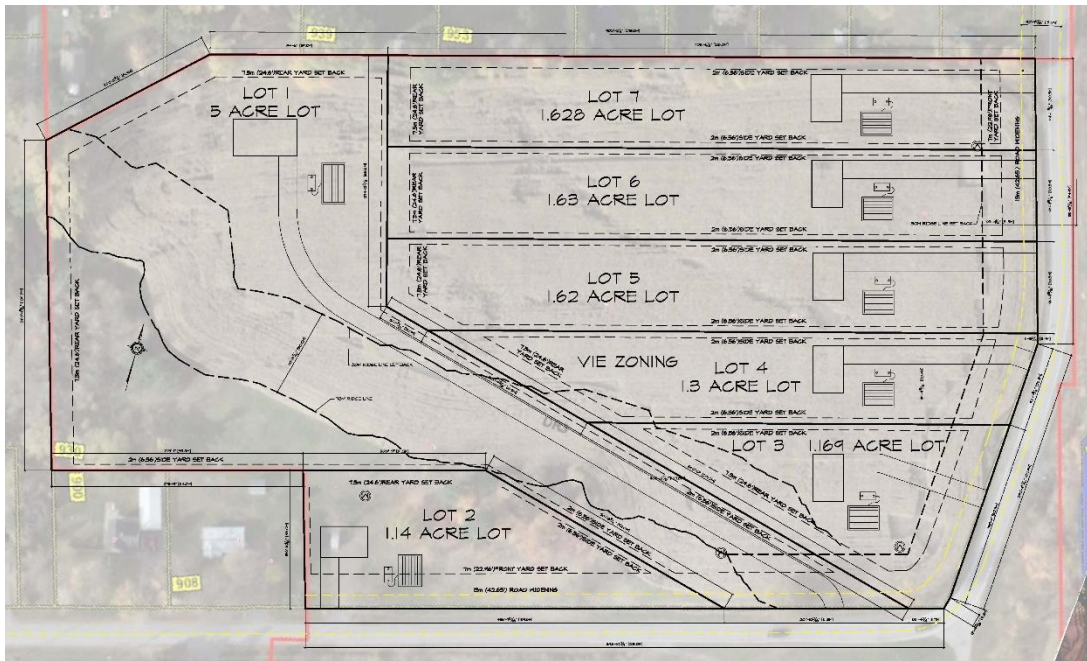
Extract of Site Plan - Overlay on the Farm
